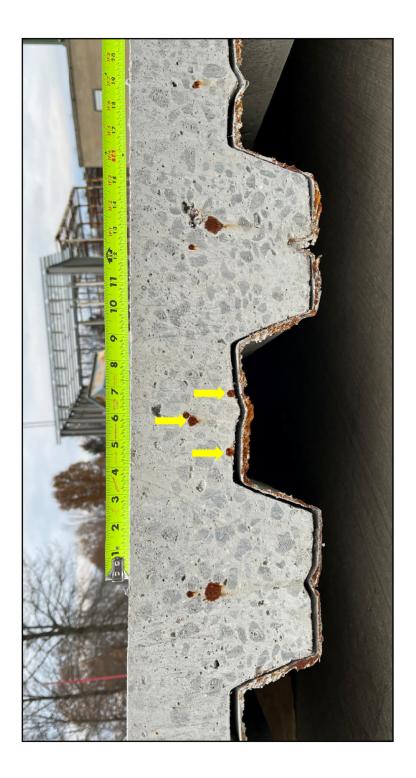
Typical cross-section of the composite floor showing the chair.
